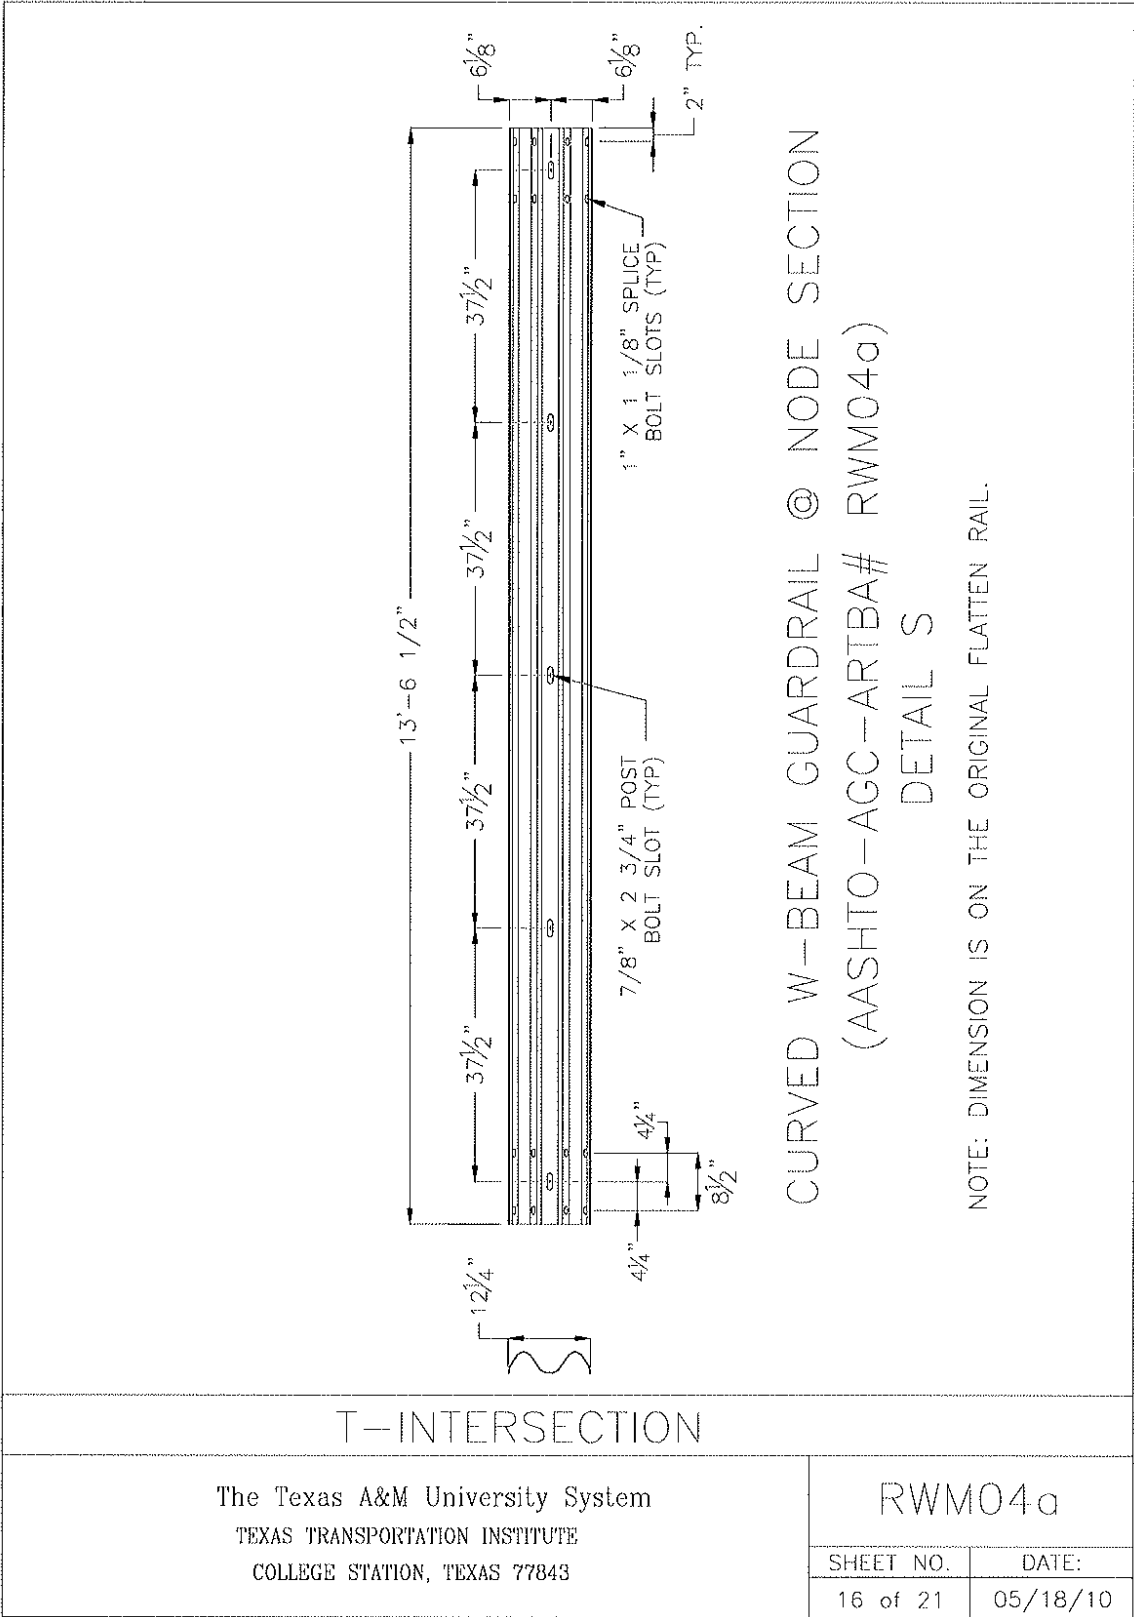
Rail Punch Details for Curved W-beam Nose Section [27]
